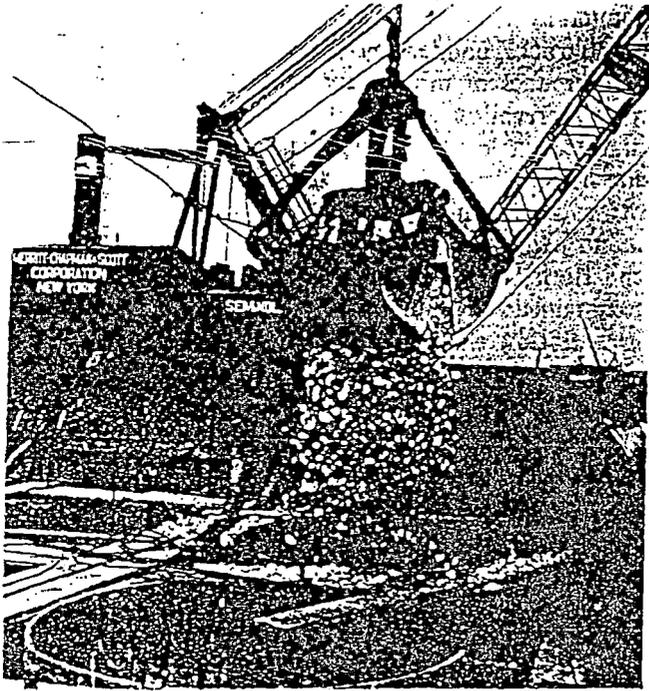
Coarse aggregate being deposited by clamshell from barge for Mackinac Bridge pier located in shallow water. Grout pipes with upper ends protected are supported by short sleeves welded to the caisson shells
